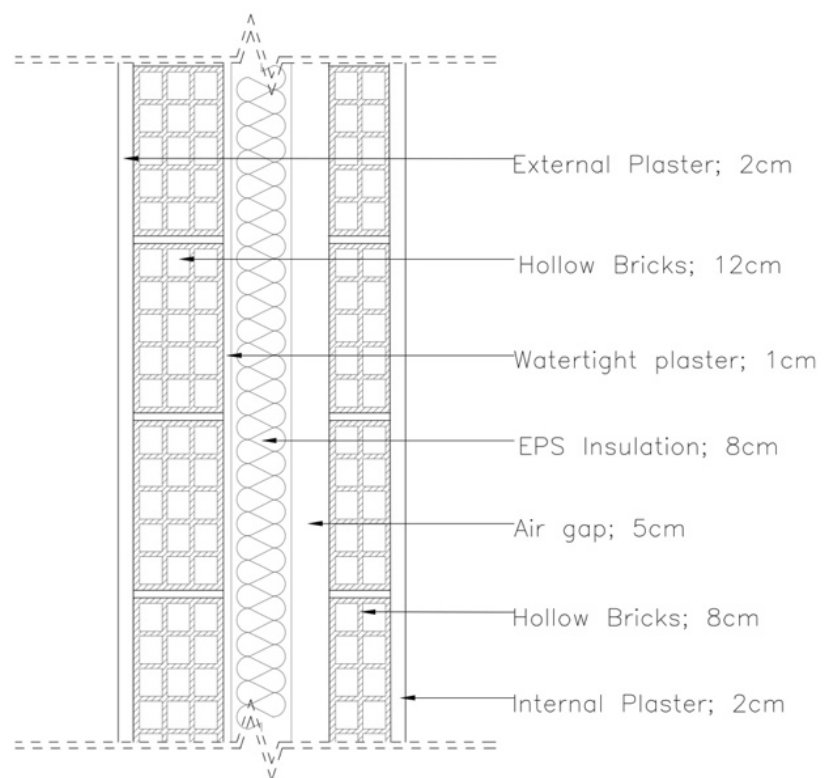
Hollow Brick & Plaster Wall Stratigraphy.
